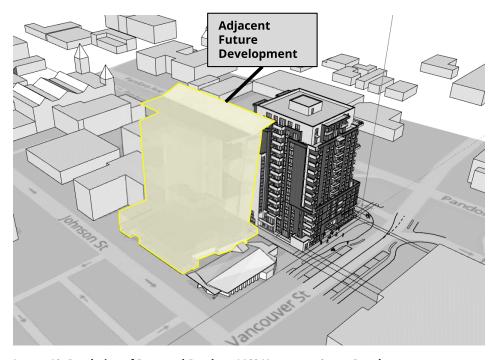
Rendering of Proposed Pandora 1468 Vancouver Street Development Including the Adjacent Future Development on Johnson Street (highlighted yellow)
